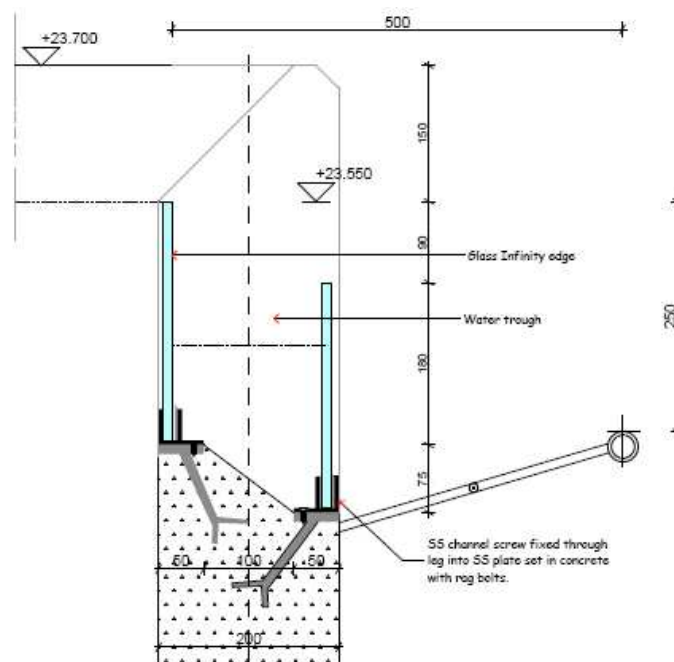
revised swimming pool infinity edge detail with a safety barrier
